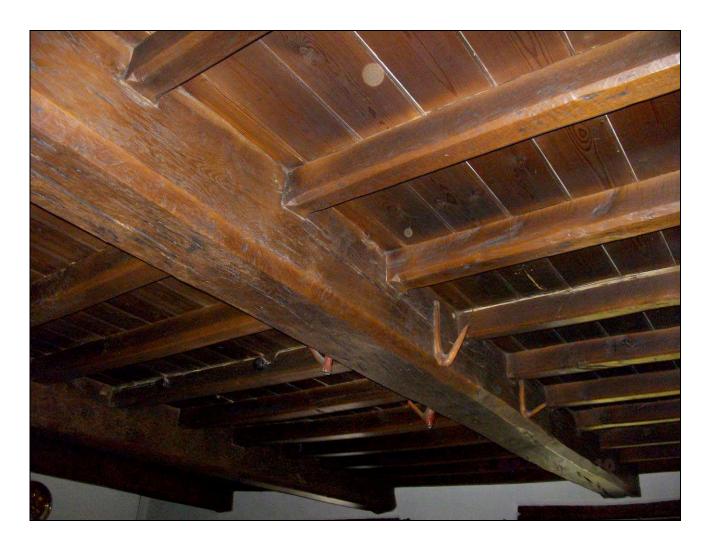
Central hall/parlour range; ceiling (photograph taken from the east)
